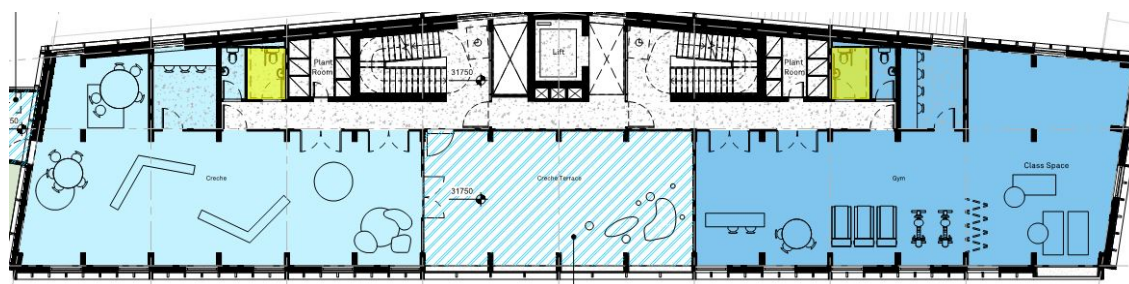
Proposed First Floor with accessible WCs indicated in Yellow
